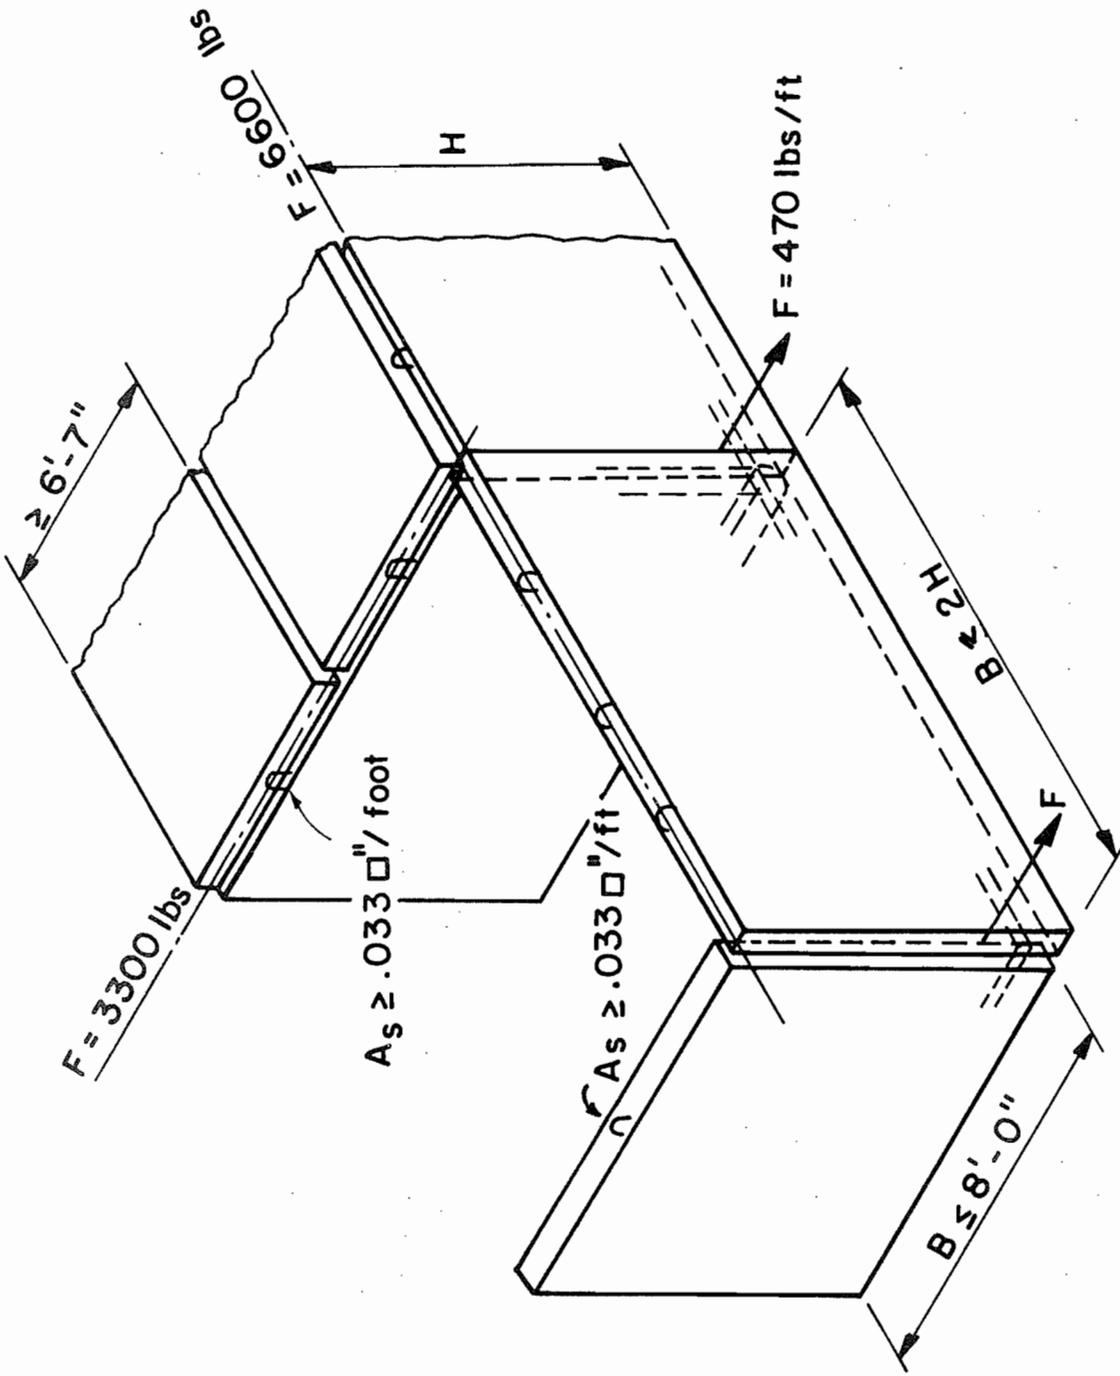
CONNECTION OF WALL PANELS TO FLOOR DIAPHRAGMS
